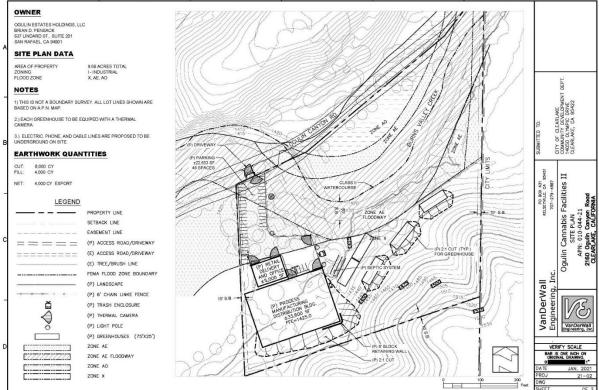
Project Site Plan (Refer to Attachment B for full plans)
